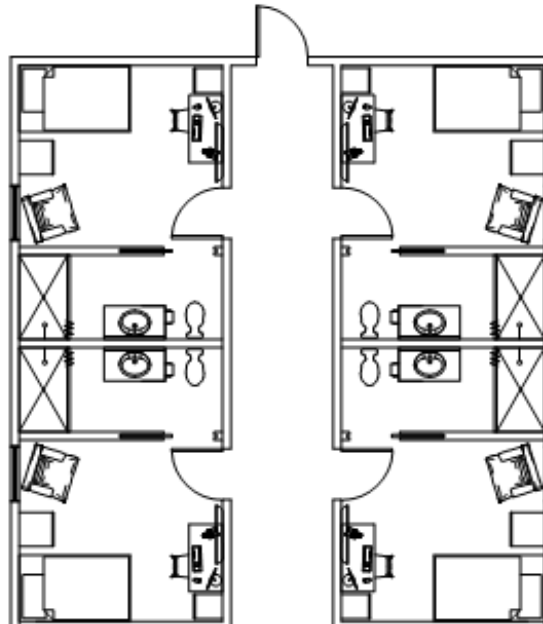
Windfall Lake permanent room complex - Room with individual bathroom.
